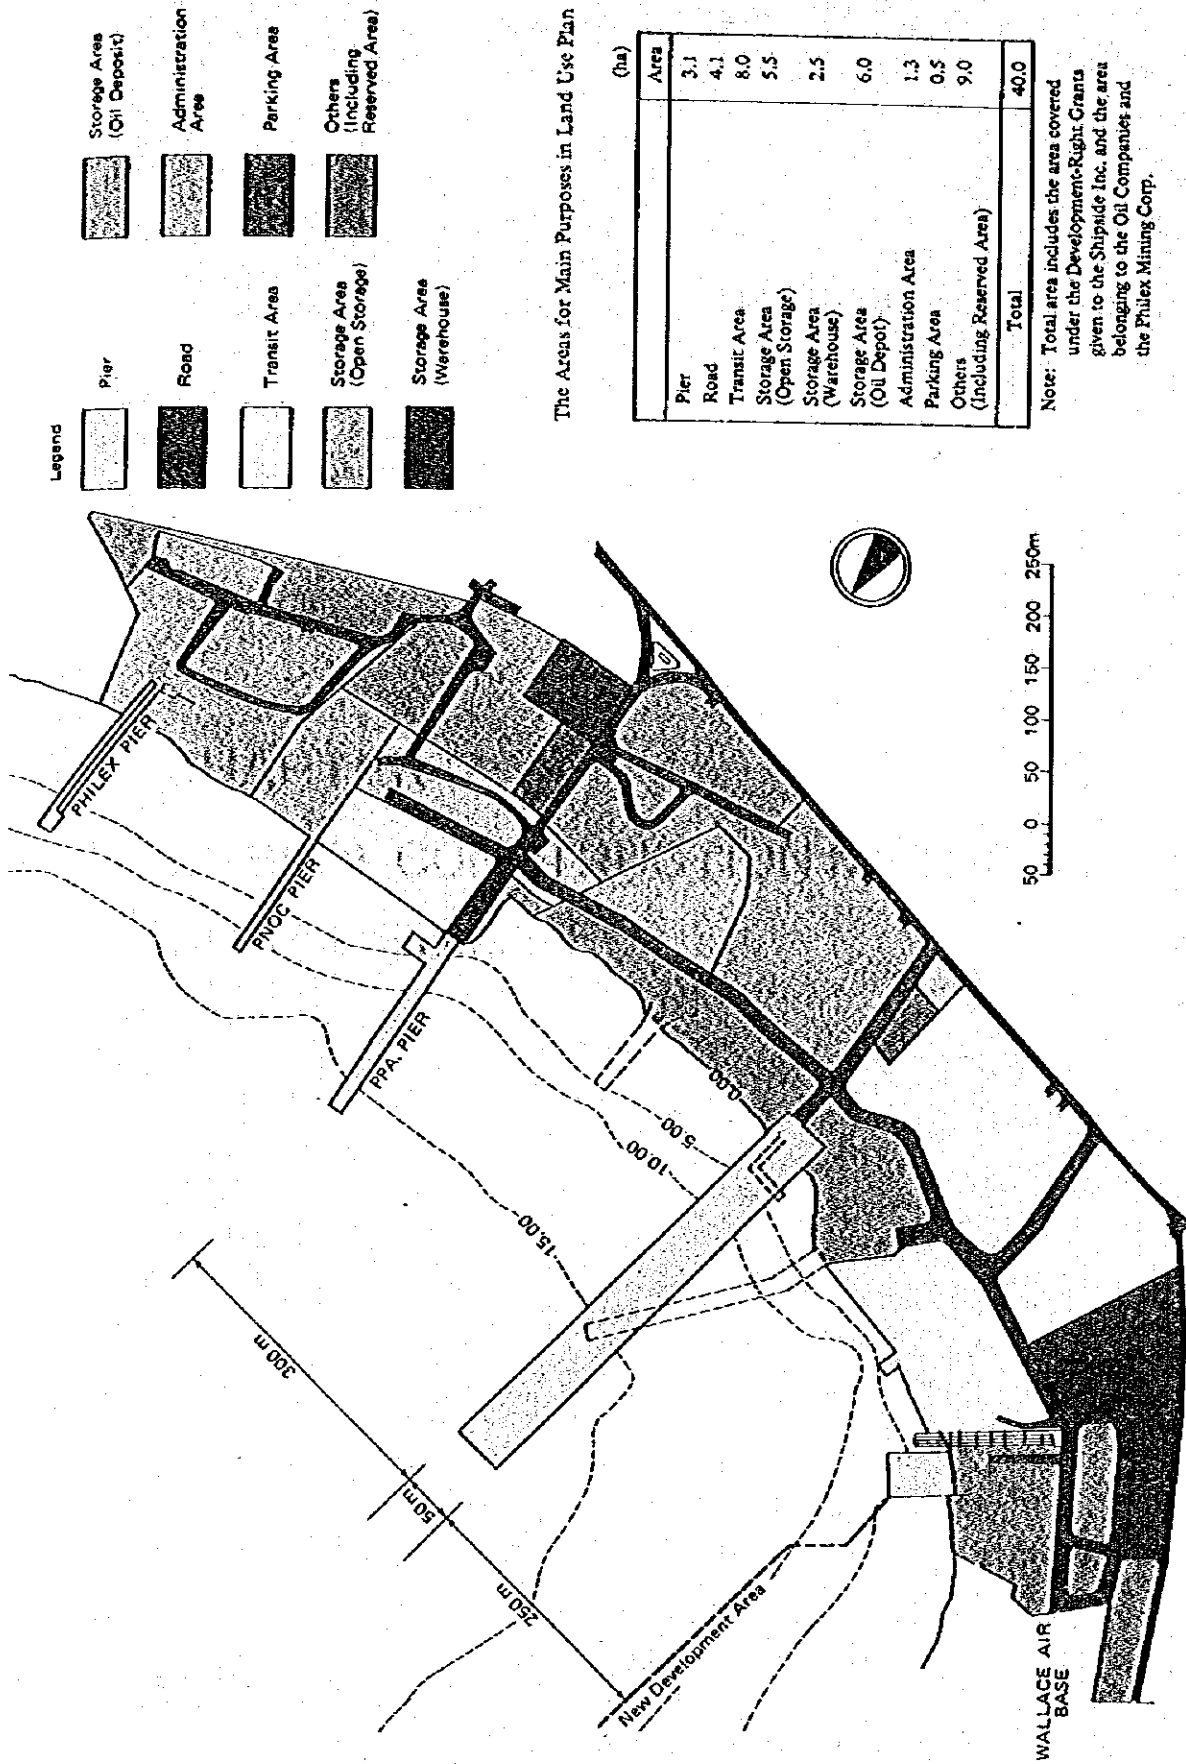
Land Use Plan for the Short Term Development Plan
